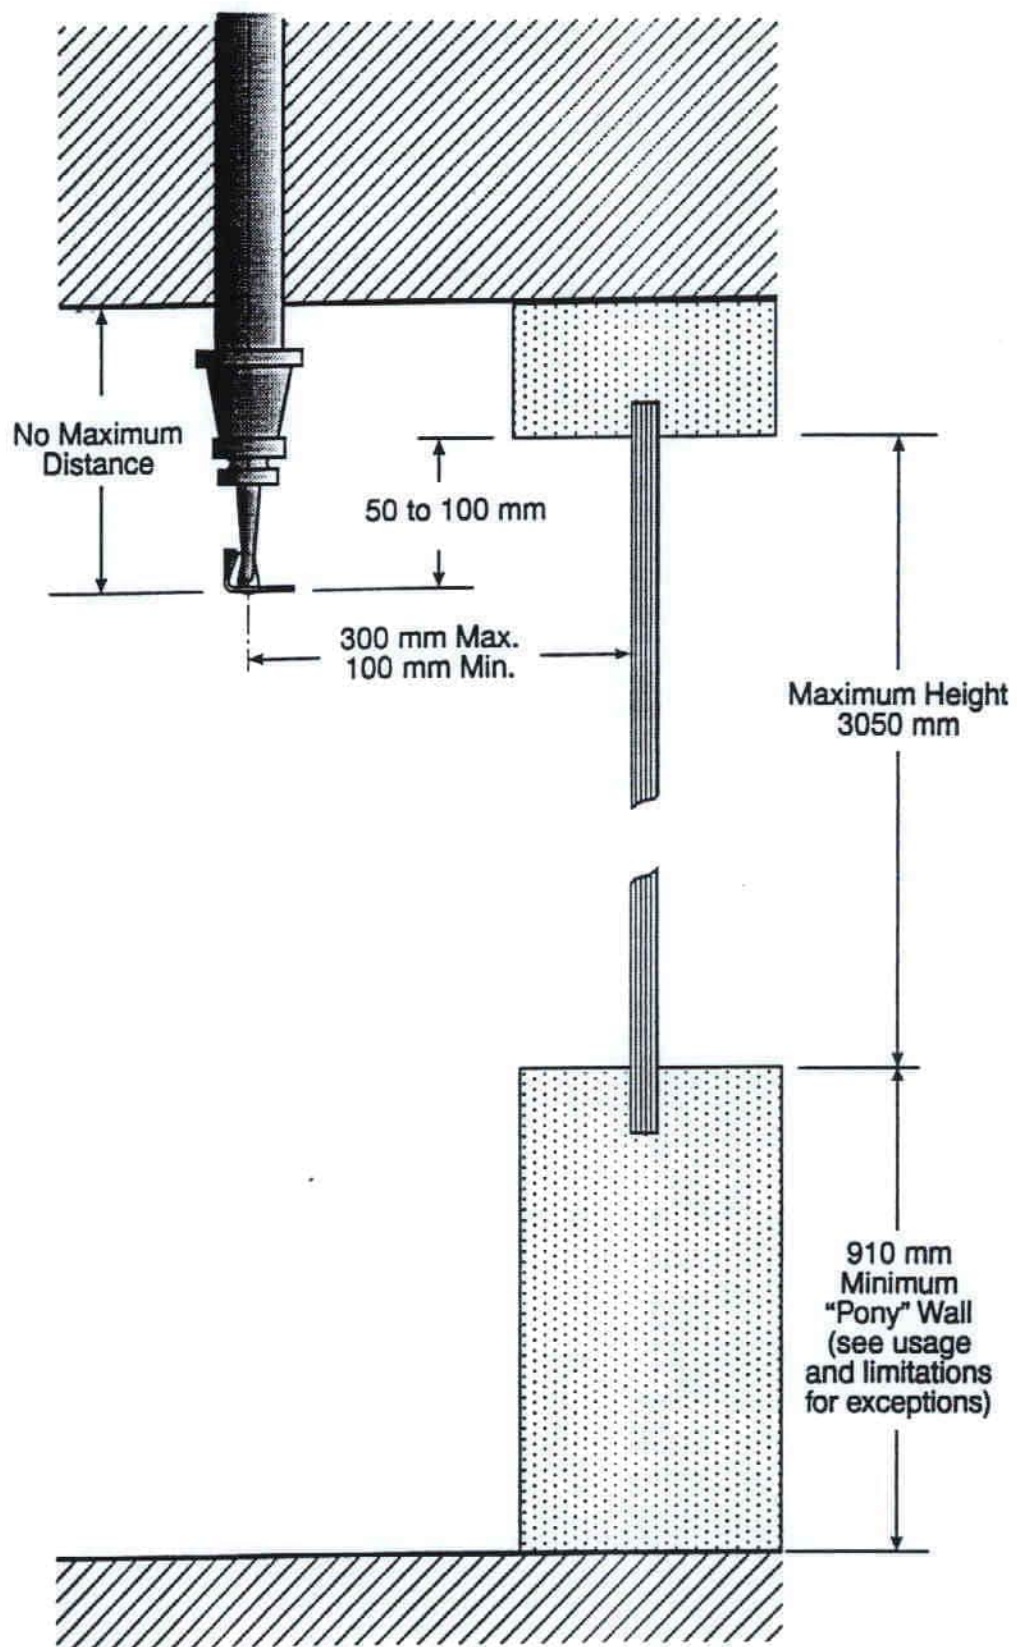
WS Pendent Vertical Sidewall Sprinkler System
